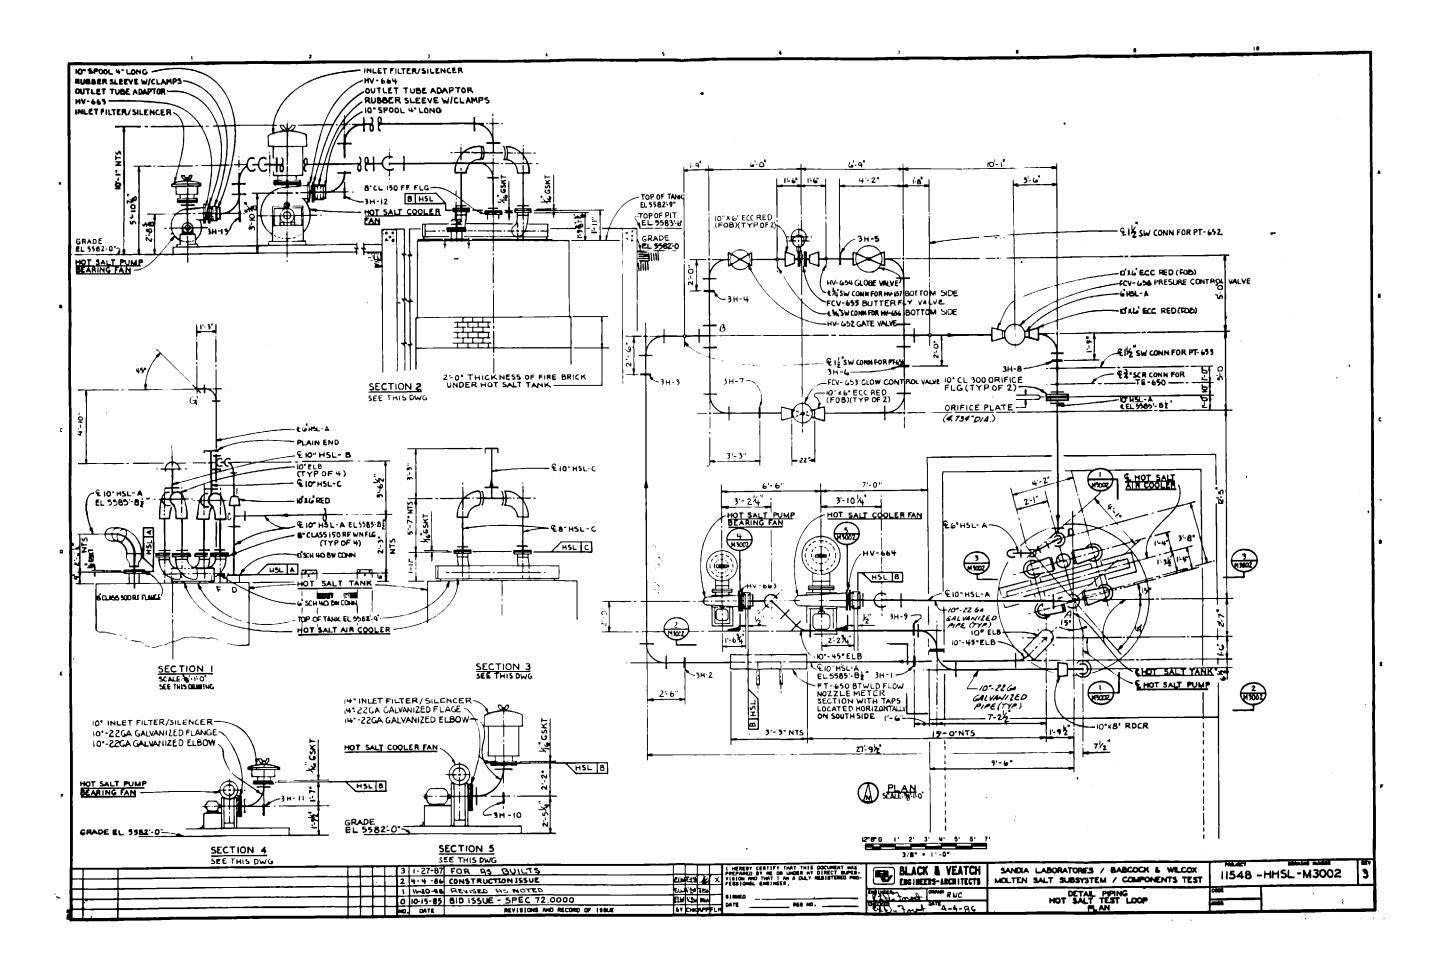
Hot Loop Arrangement Drawing. B&V Drawing M3002.
